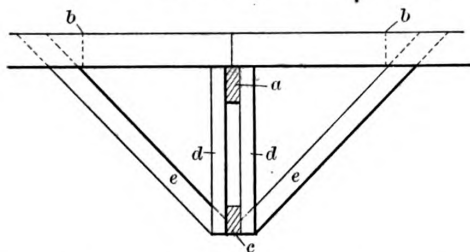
Section of Purlin Plate.—Scale, $\frac{1}{4}$ Inch to the Foot.
